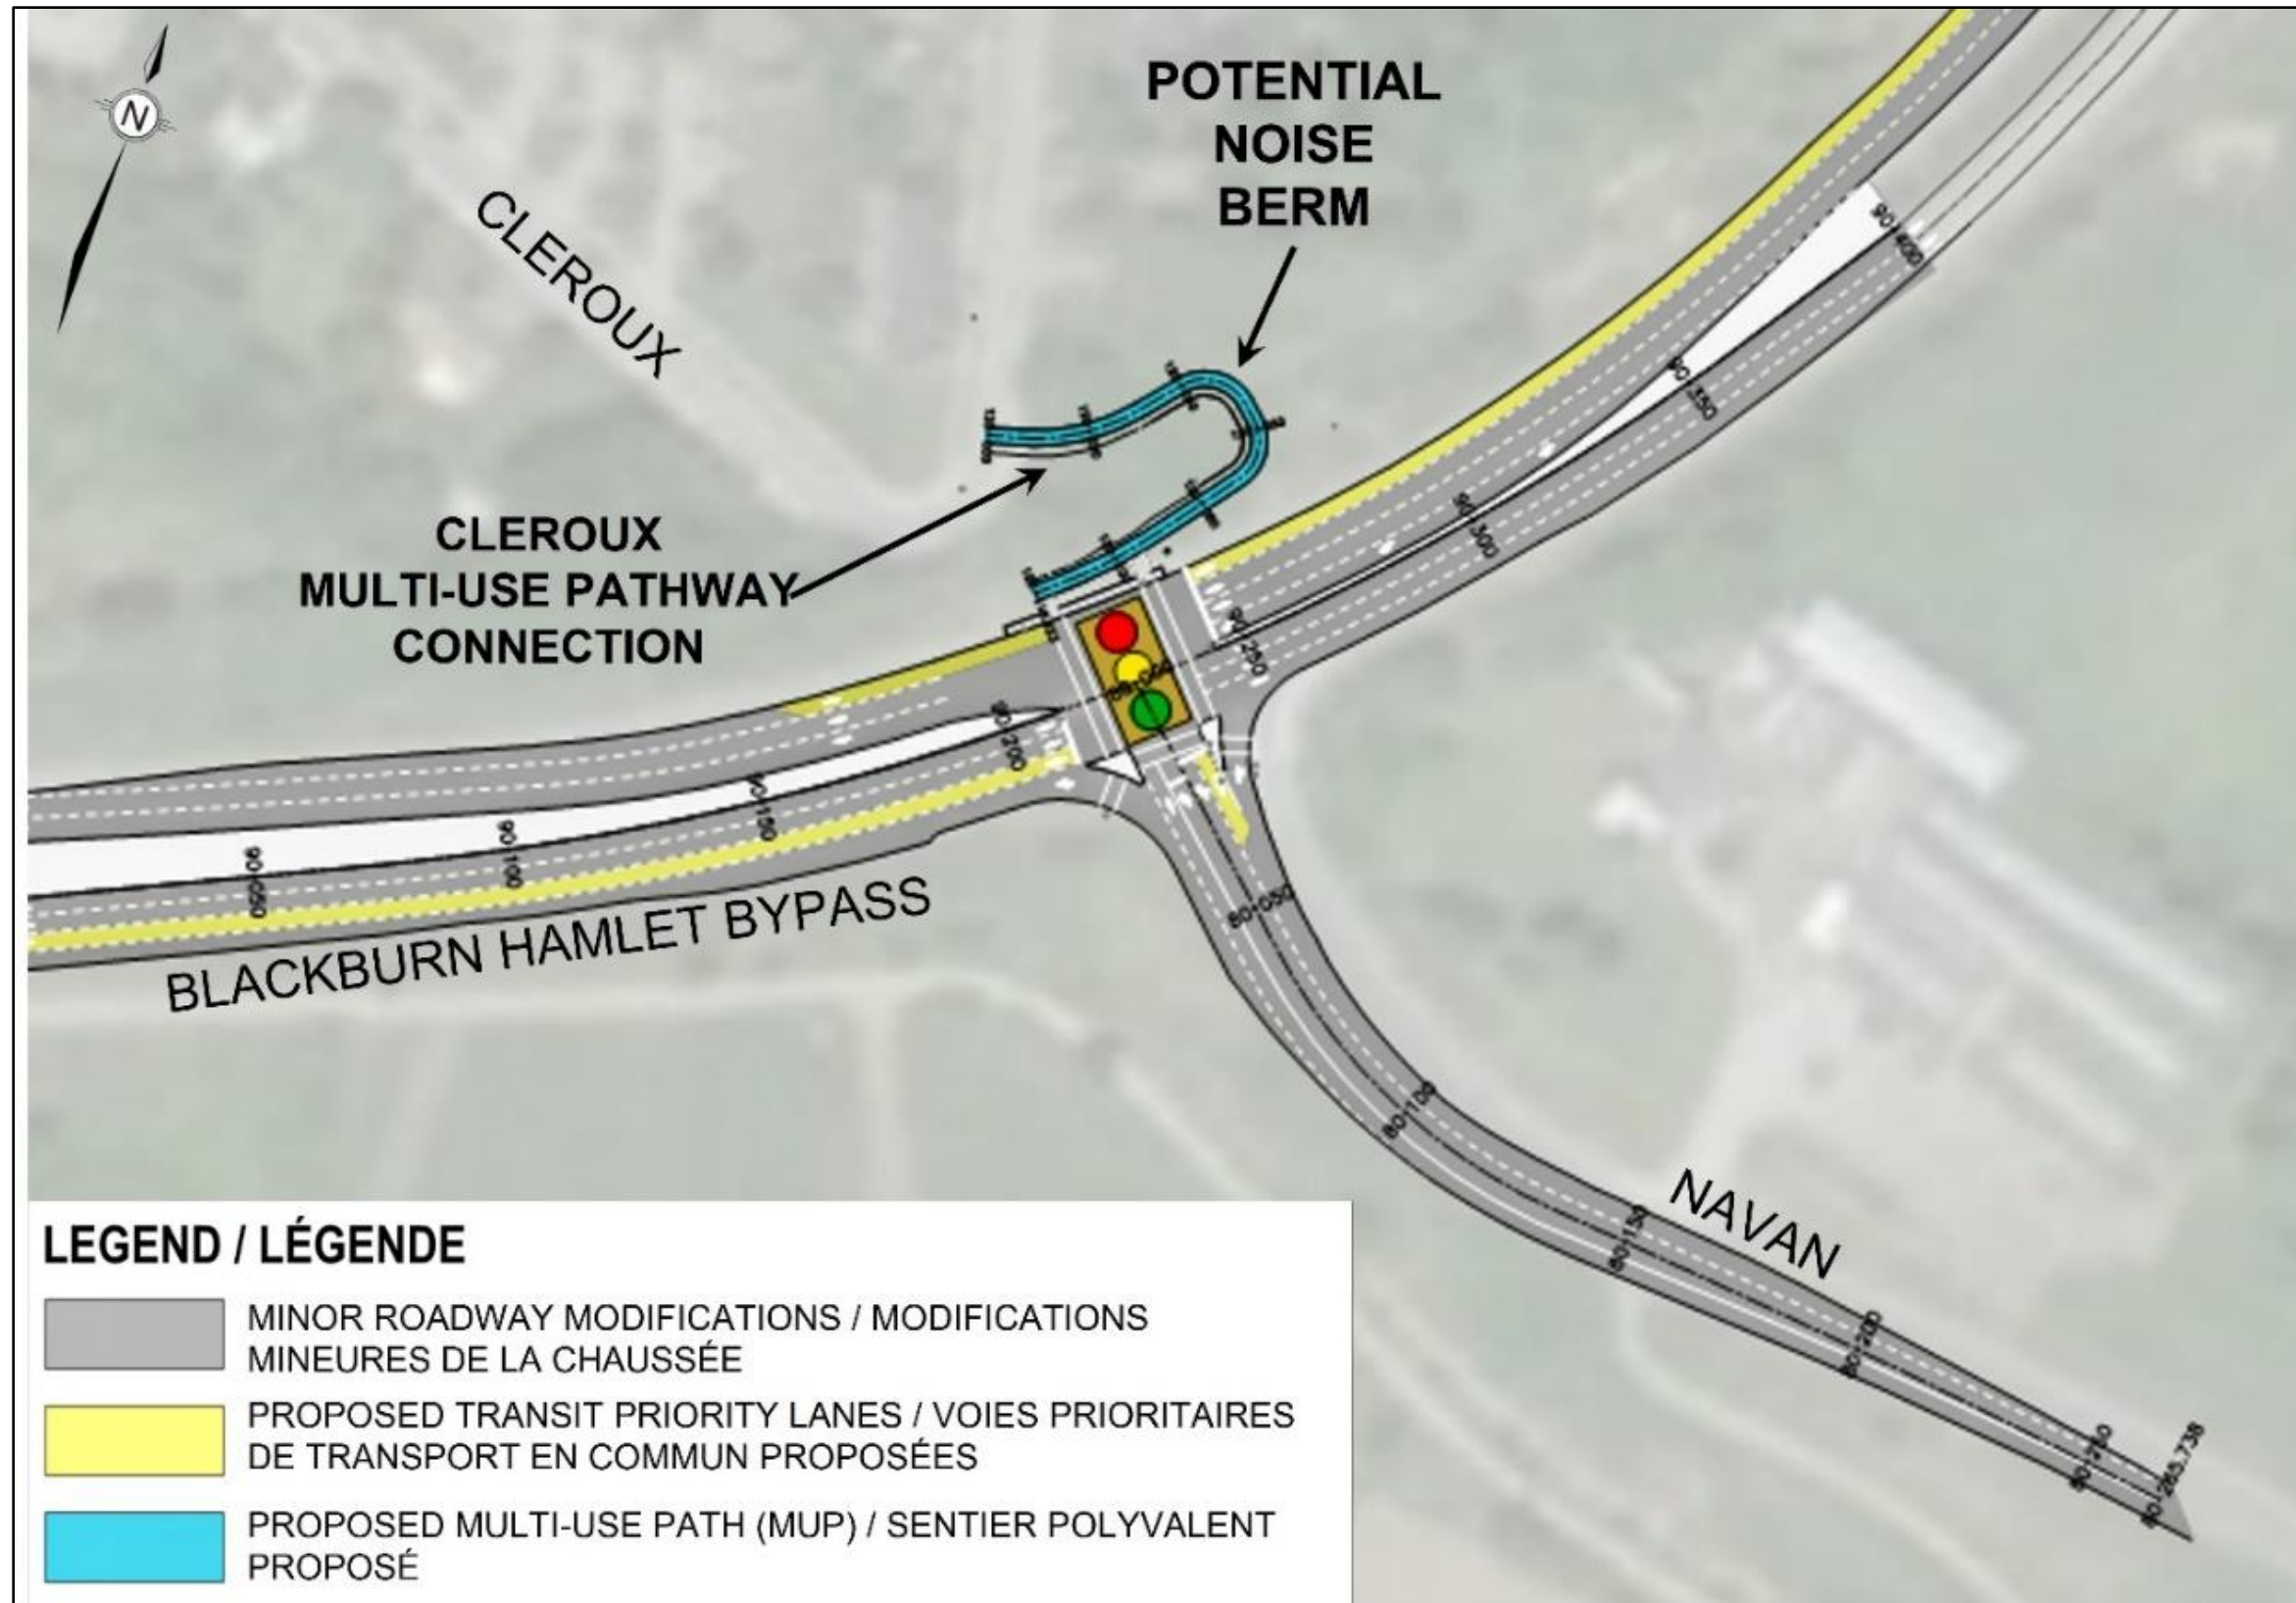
Recommended Plan – Blackburn Hamlet Bypass & Navan Road Intersection
